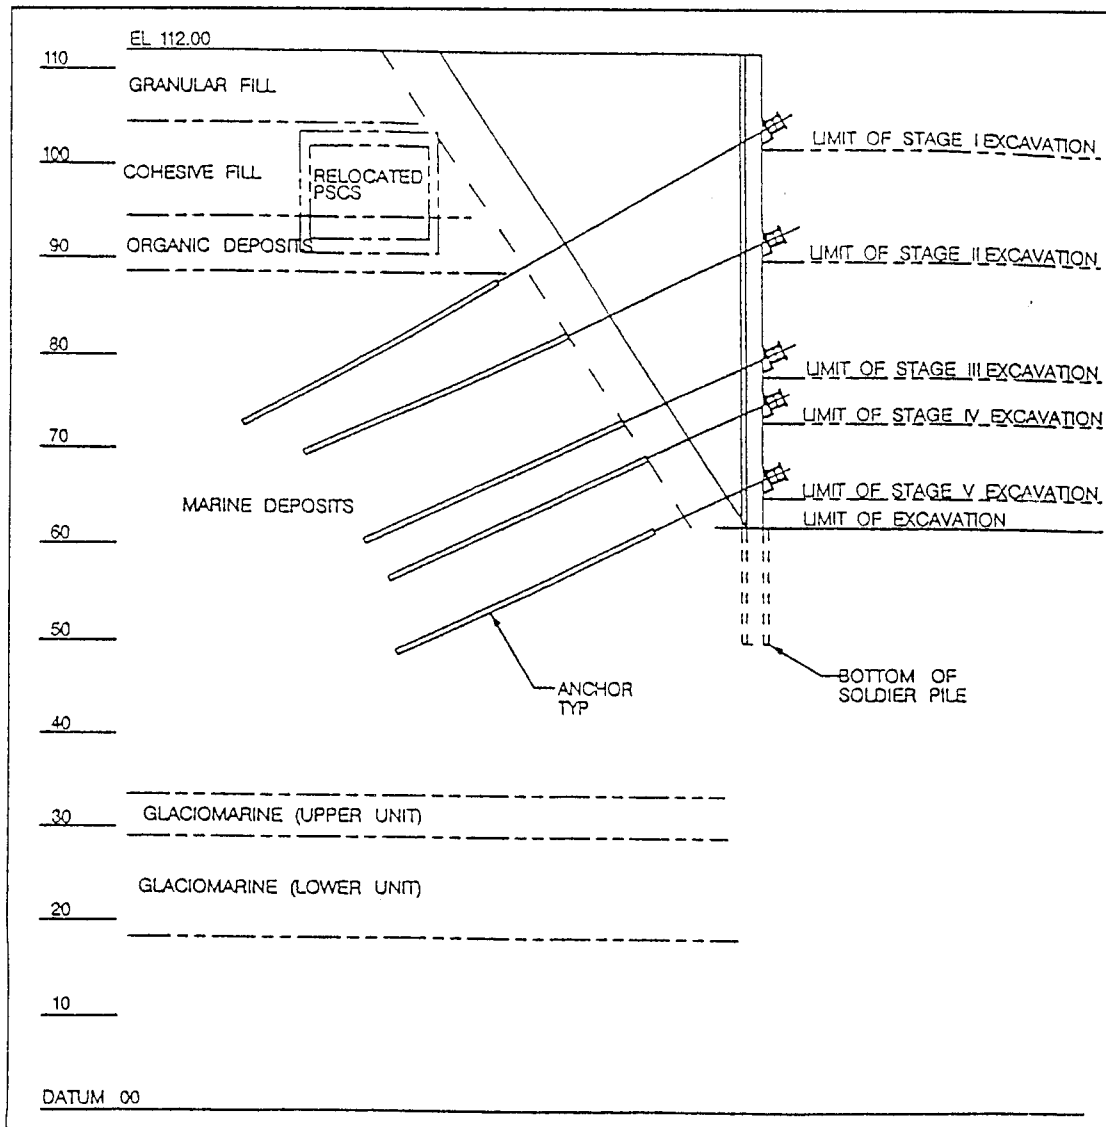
Typical foreseen East Wall section (STA157+70) in Zone C.
